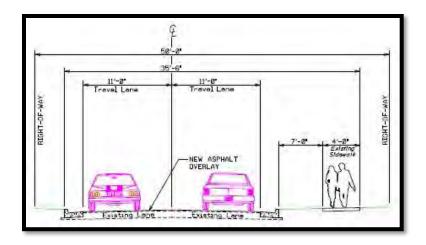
Proposed Typical Section – Alternative 4 – Hook St. from North Commons to Douglas St.
